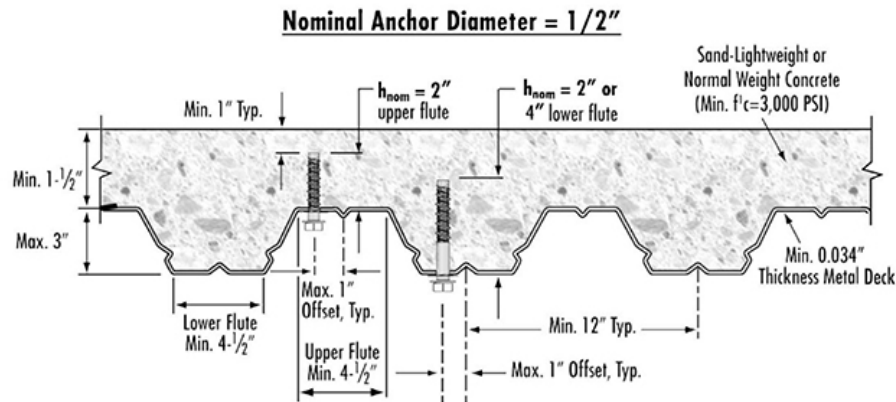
TAPCON+ SCREW ANCHOR LOCATED IN THE SOFFIT OF CONCRETE OVER STEEL DECK FLOOR AND ROOF ASSEMBLIES (1 inch = 25.4 mm)
